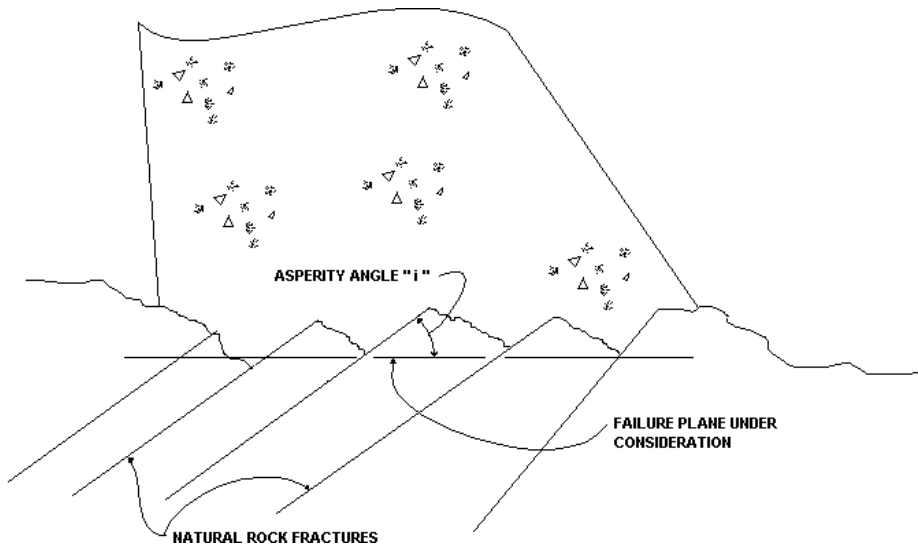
Concrete to rock foundation interface showing asperities interrupting potential failure plane
